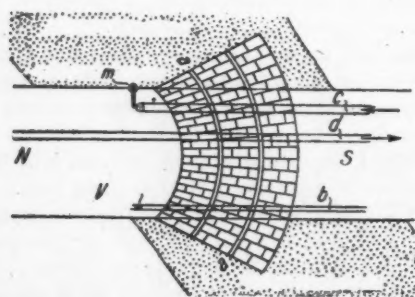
VERTICAL SECTION OF BARRIER.
